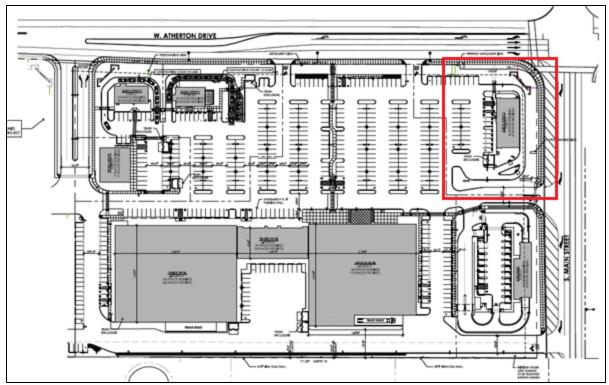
Approved Marketplace@Main shopping center site plan (McDonald's outlined in red)
